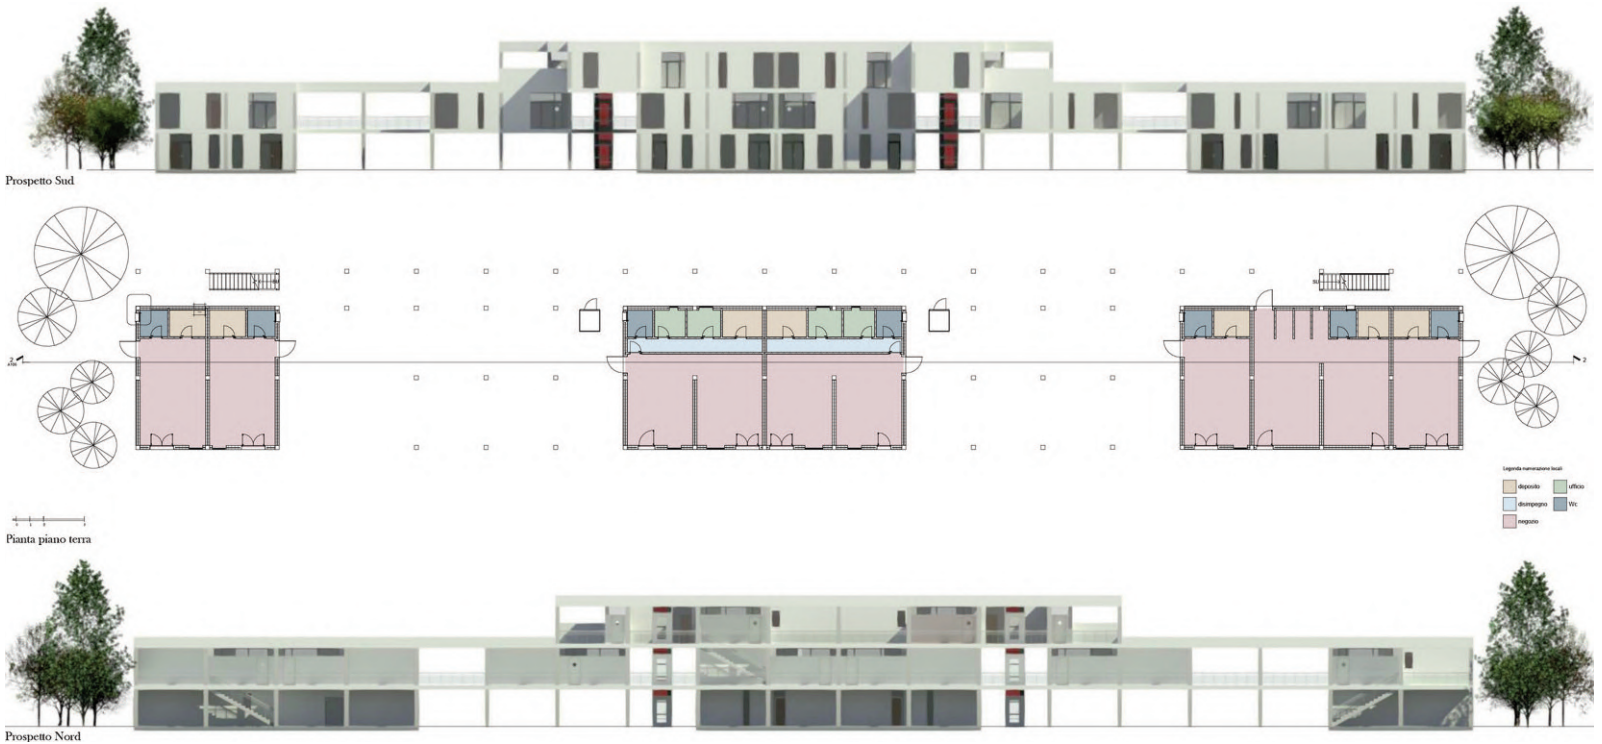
Ground floor plan and North and South elevations from BIM platform (credit: R. Russo).
